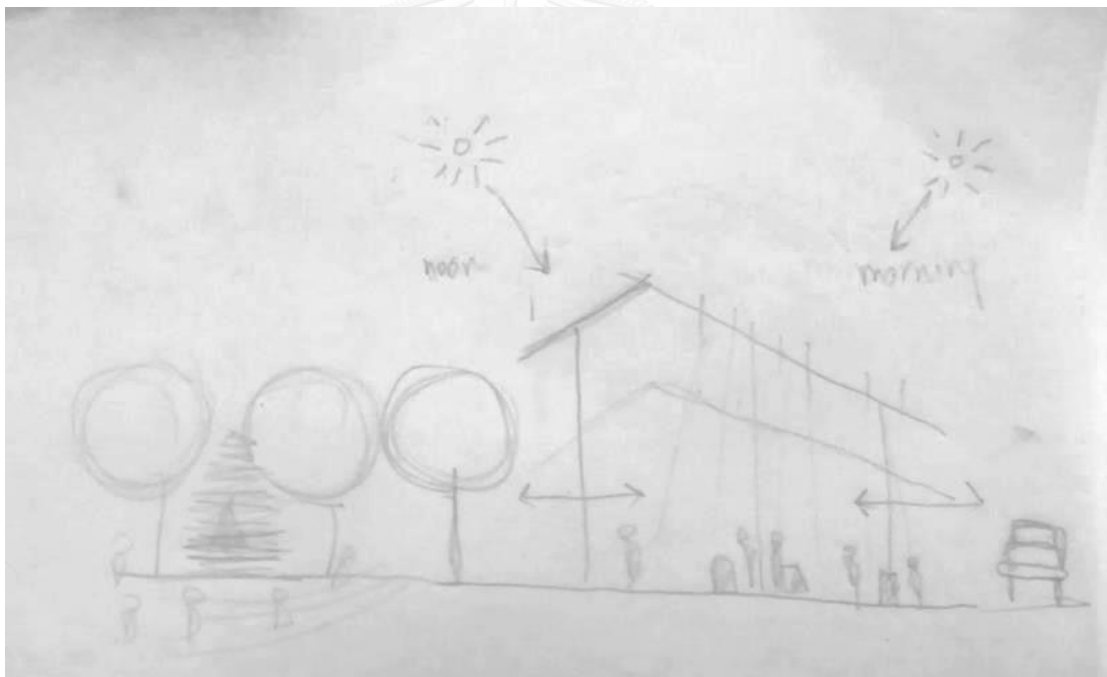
Connection between Brahman Shrine Park, Bang Pli Yai Nai Market and the car park. Sketch by the author.
